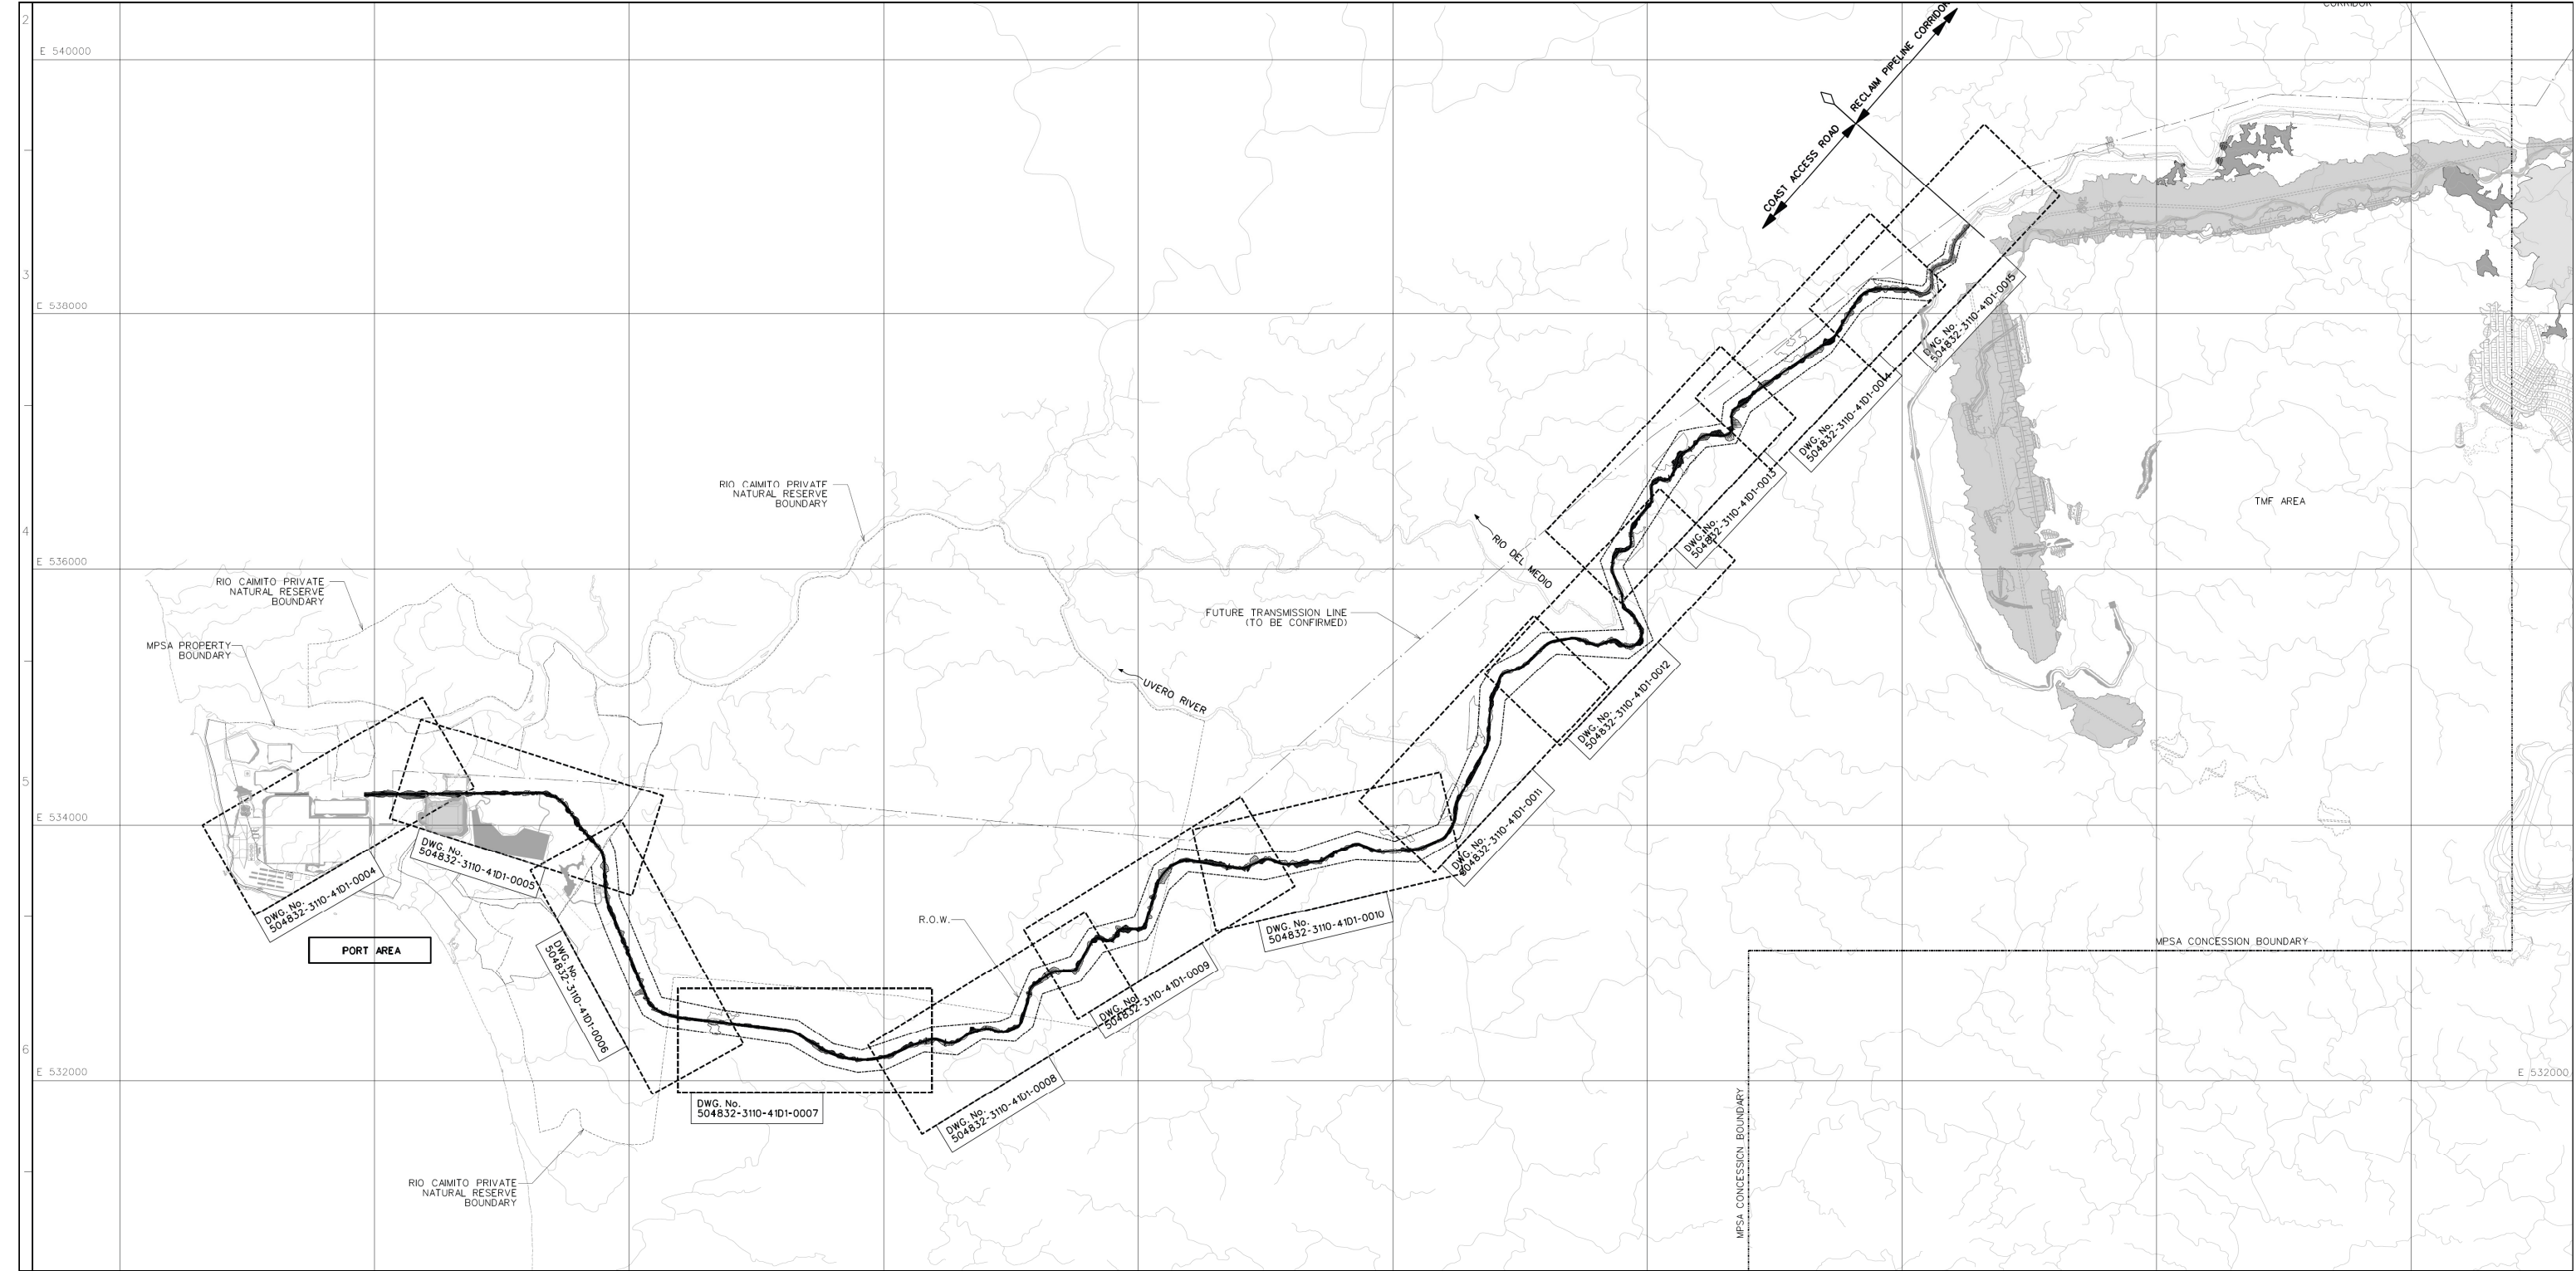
6: Port to Plant Access Road Overall Plan 504832-3110-41D1-0000
